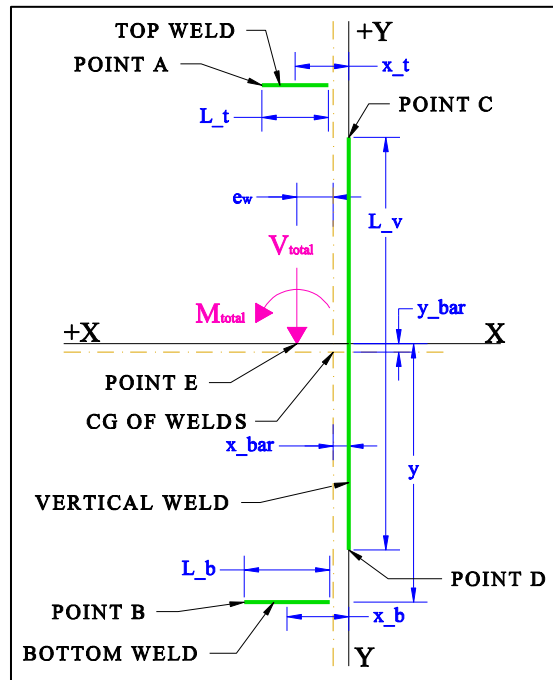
Forces on welds of transverse stiffener to G2 at Section A
